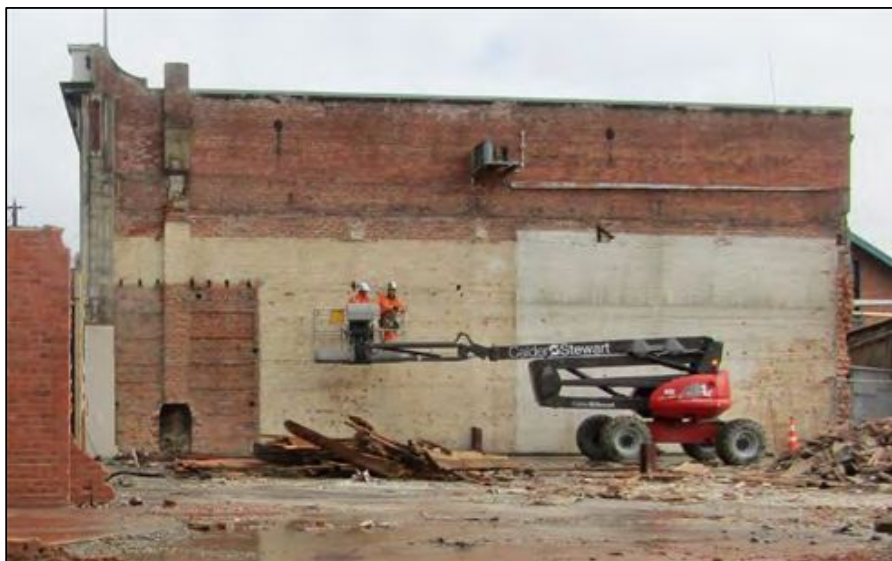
West wall of the Rialto exposed during demolition showing painted sections.
